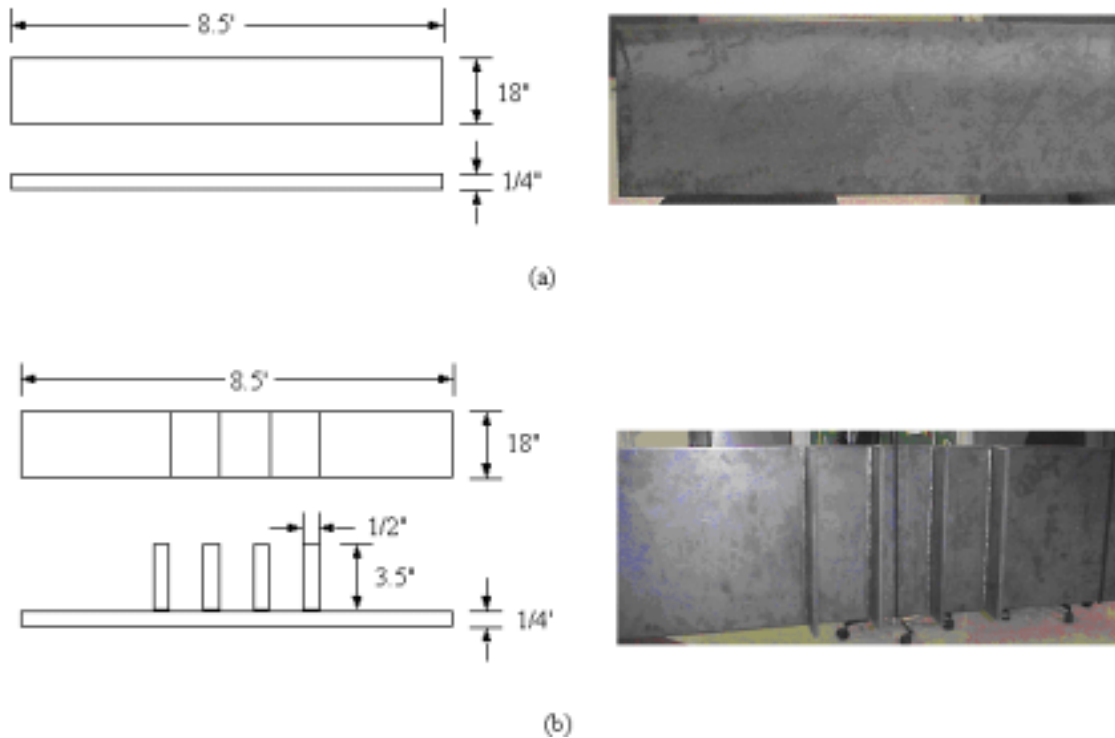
8.5-foot test structures (a) flat plate (b) stiffened plate
